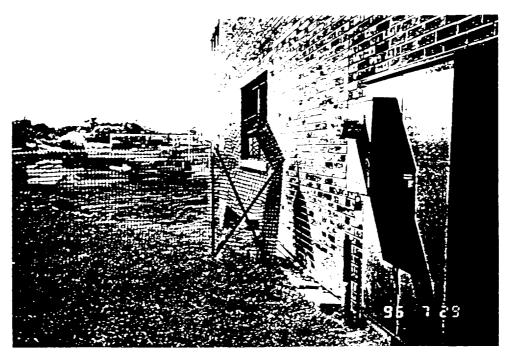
Suspect UST location on southwest corner of building. Note vent and fill pipes
